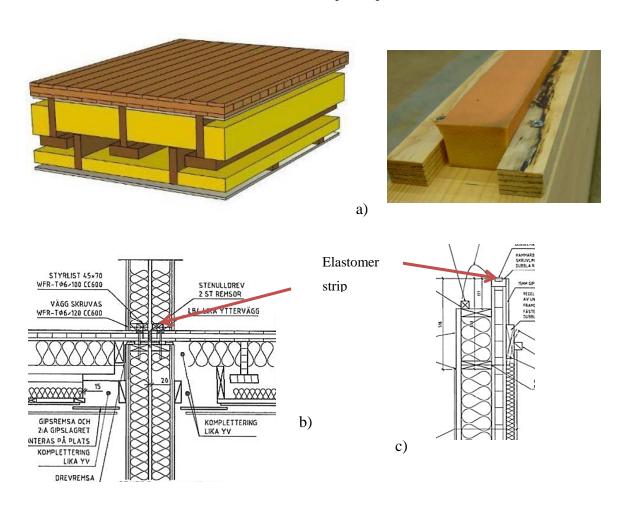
Elastomer flanking couplings for decoupling of the floor from the supporting structure, construction A: a) Separate CLT floor and ceiling. Elastomer strips loaded by the floor cassette. b) Coupling for apartment separating walls. c) Outer wall with a CLT load bearing wall plate and a radiation protection isolating layer.
